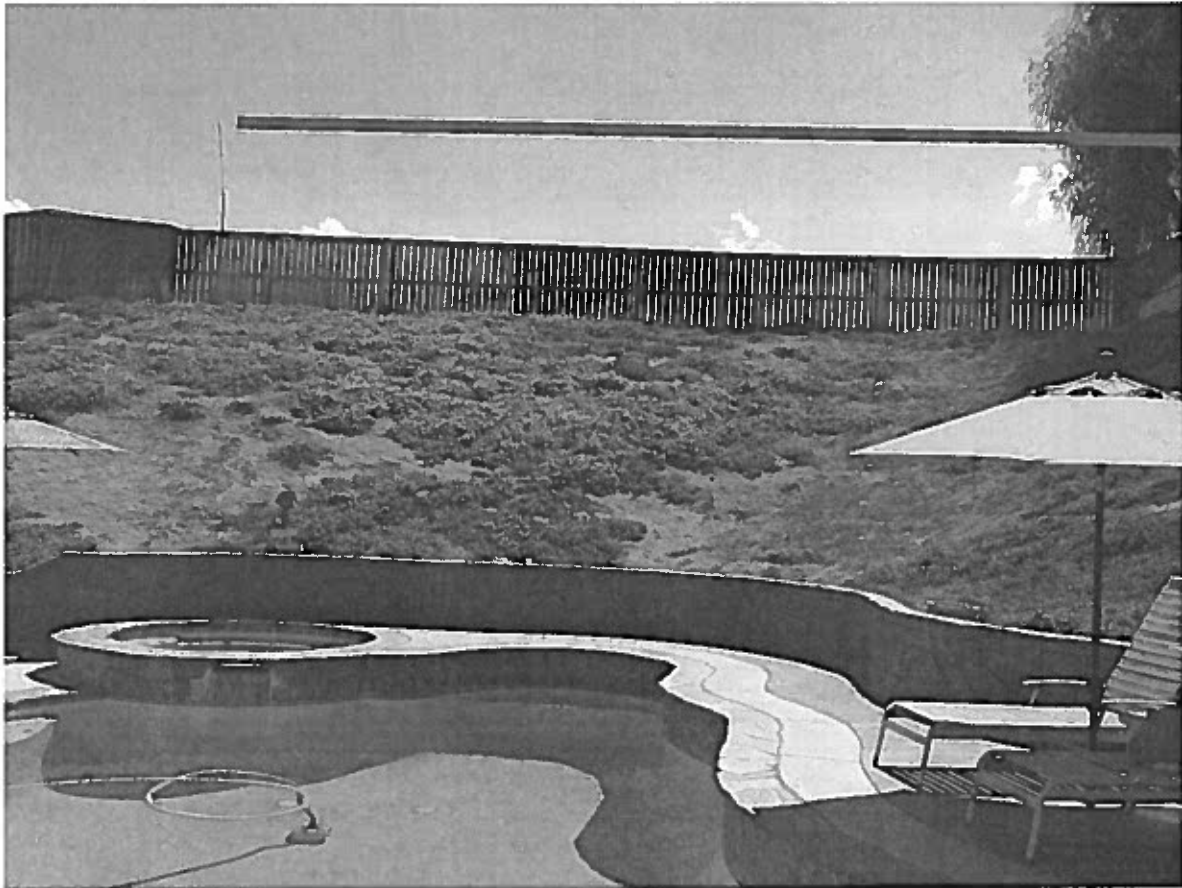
View from backyard of home neighboring proposed project. Note height of wall that will impact aesthetics of home. Red line added for effect to show where top of wall is projected to be using flagpole set-up by developer.
